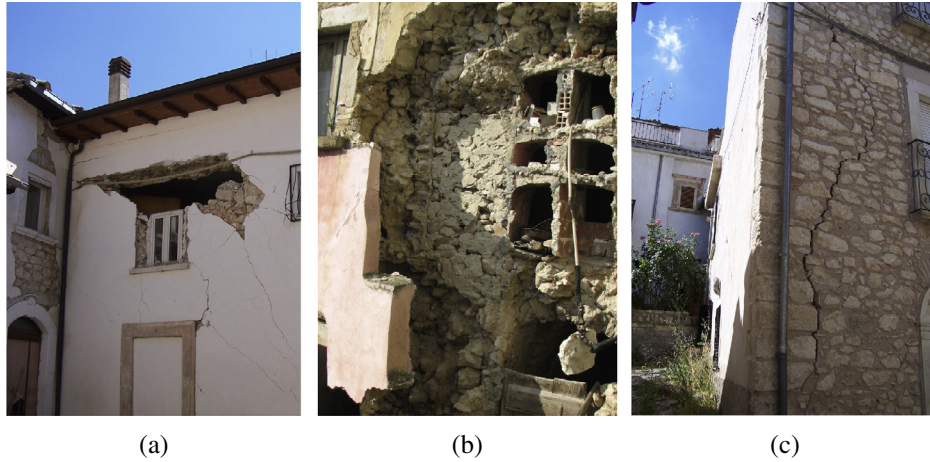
Main local mechanisms: (a) lintel failure; (b) collapse of the masonry external layer; (c) vertical cracks in masonry piers.
